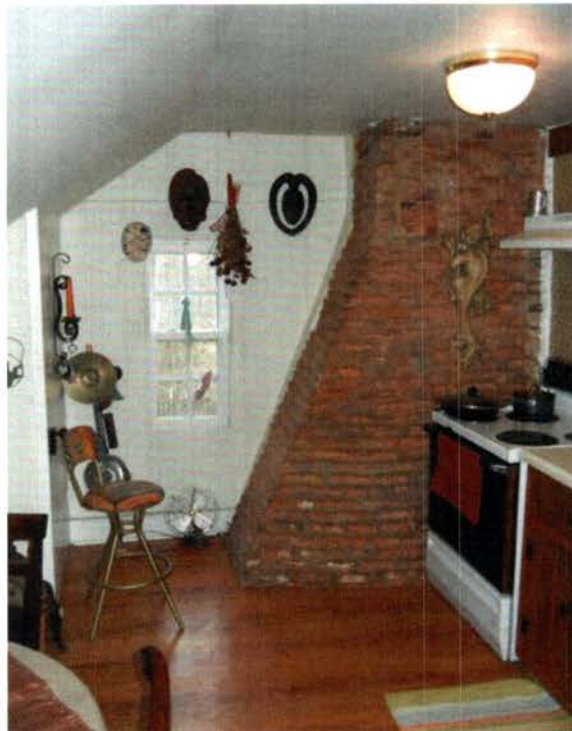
Kitchen (Room 203) looking south to the exposed brick chimneystack of the south fireplace in the Living Room (Room 103) below. The caretaker's Bath and Kitchen cannot be used for their intended purpose because the septic system that served the plumbing fixtures in these rooms was removed by the Township.
